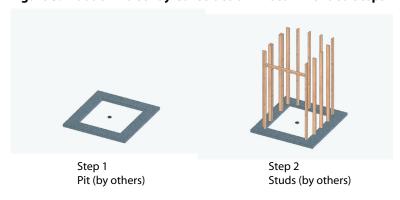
illustrates the recommended steps for constructing a wooden hoistway.
